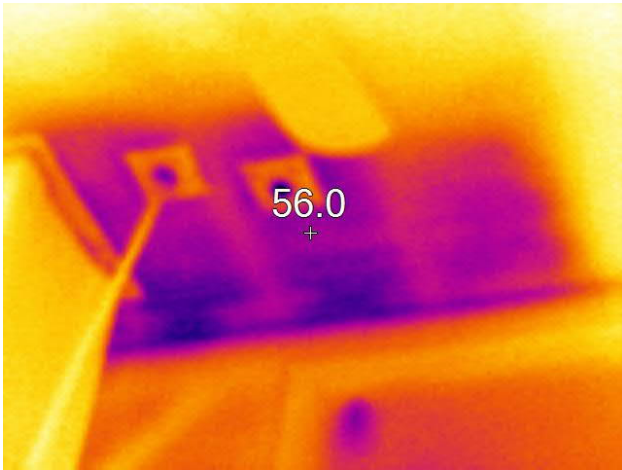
Small area of uninsulated ceiling in the rec. office adjacent to the exterior wall.
